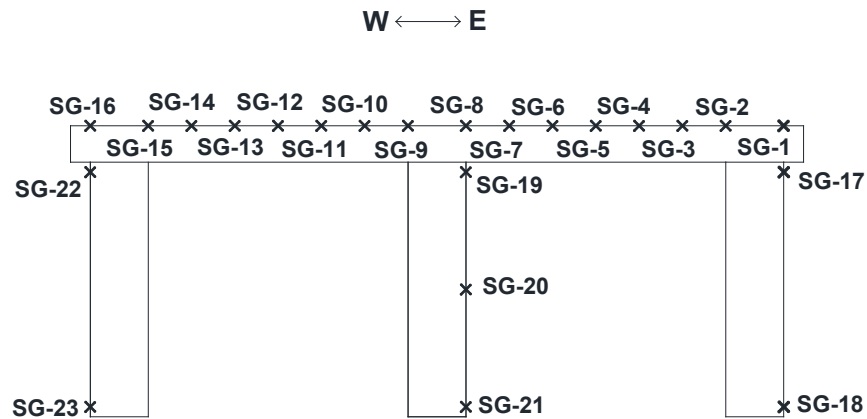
Strain Gauge Plan for Timber Girder Bridge
